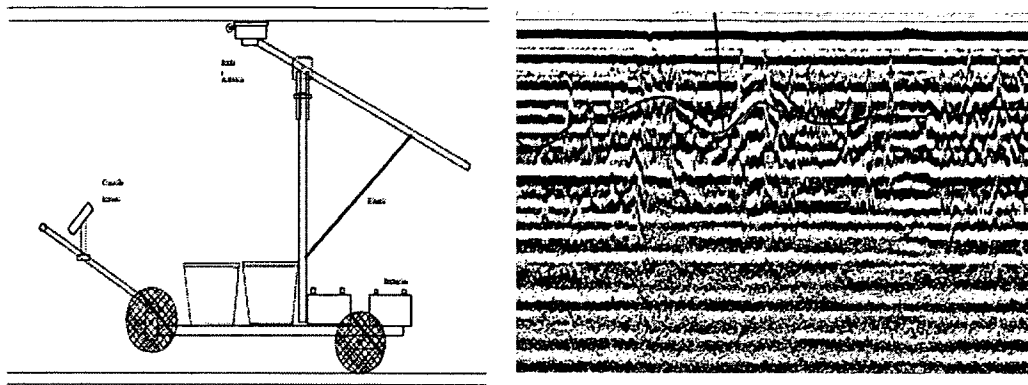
GPR inside a concrete tunnel (left); radar profile (right) [Parkinson et al. 2008].
